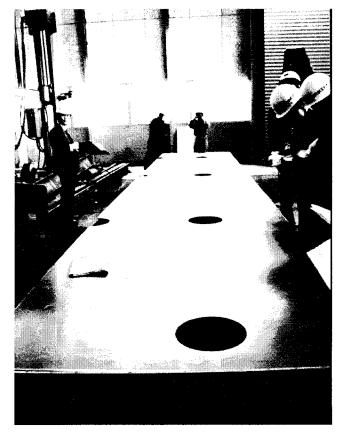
Inspecting a beamless steel floor slab, also intended to act as finish.
